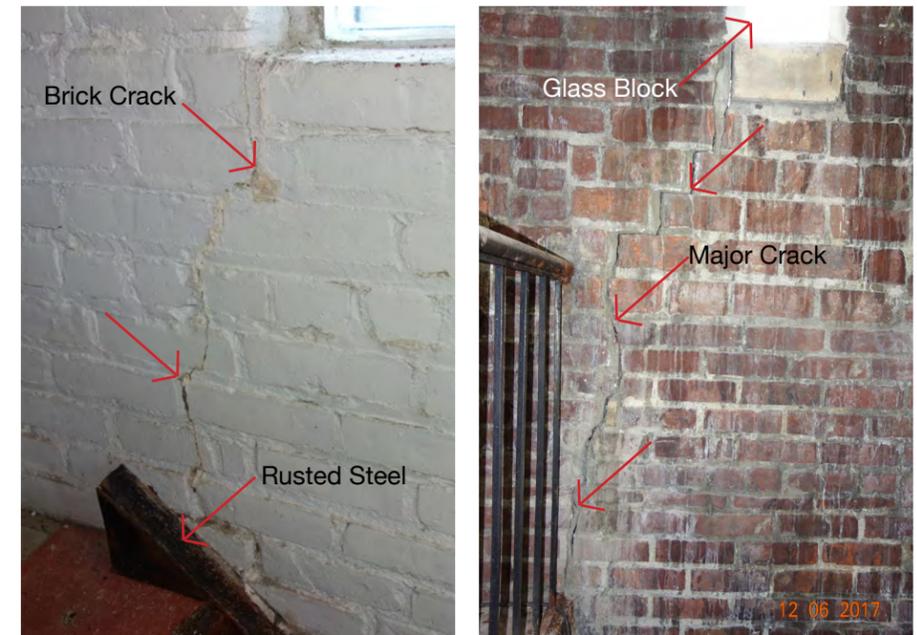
10 Major Cracks at Painted Brick (left) and Hose Hoist. Level (right)
